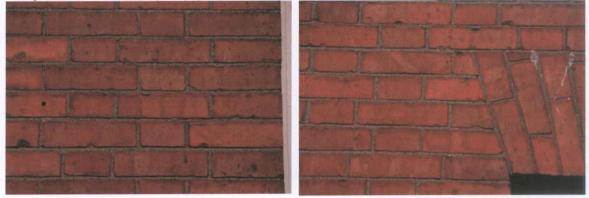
Detail of the brickwork at the façade, showing 'kiss marks' from the firing process.
